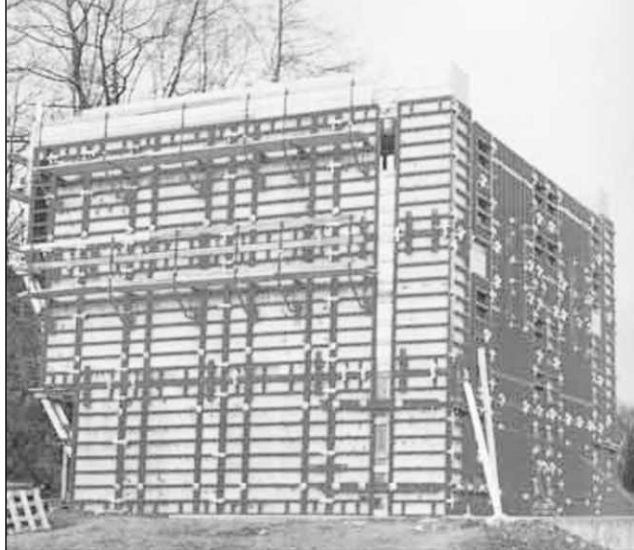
Trio Structure Formwork System (Courtesy PERI).
